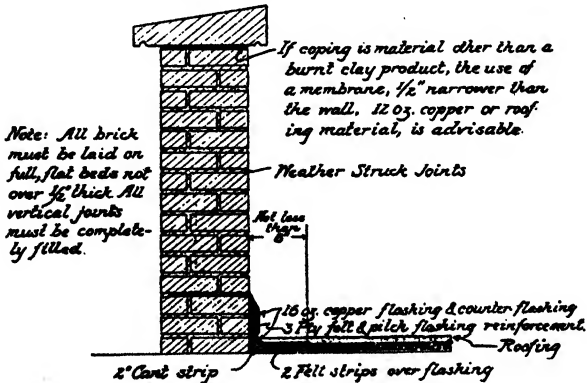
Weathertight construction of parapet walls is of utmost importance. Use only best materials and workmanship.
